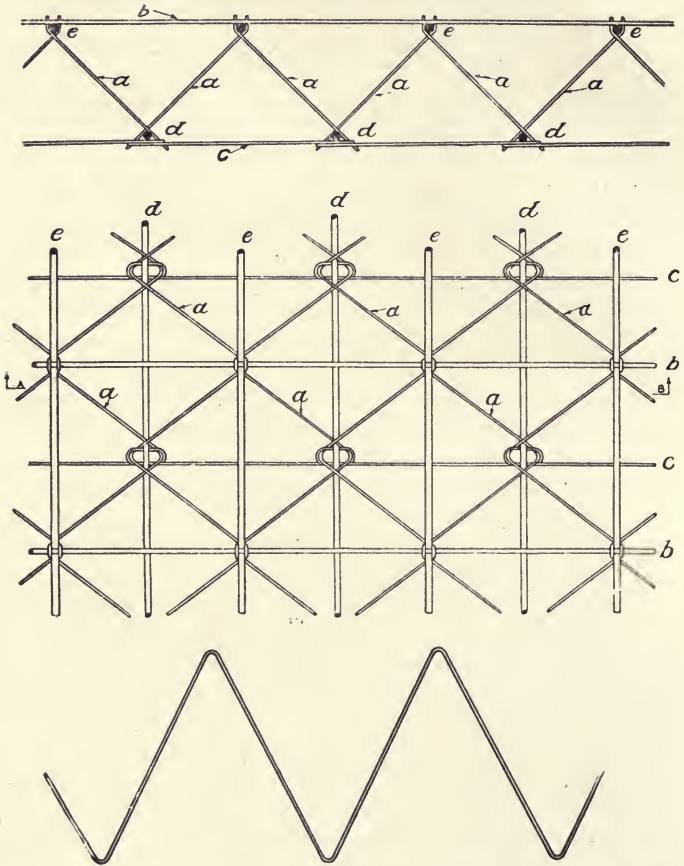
Pyramidal interlocked reinforcement for roads, rafts, floors, etc., as used for Port of London Authority roads.
